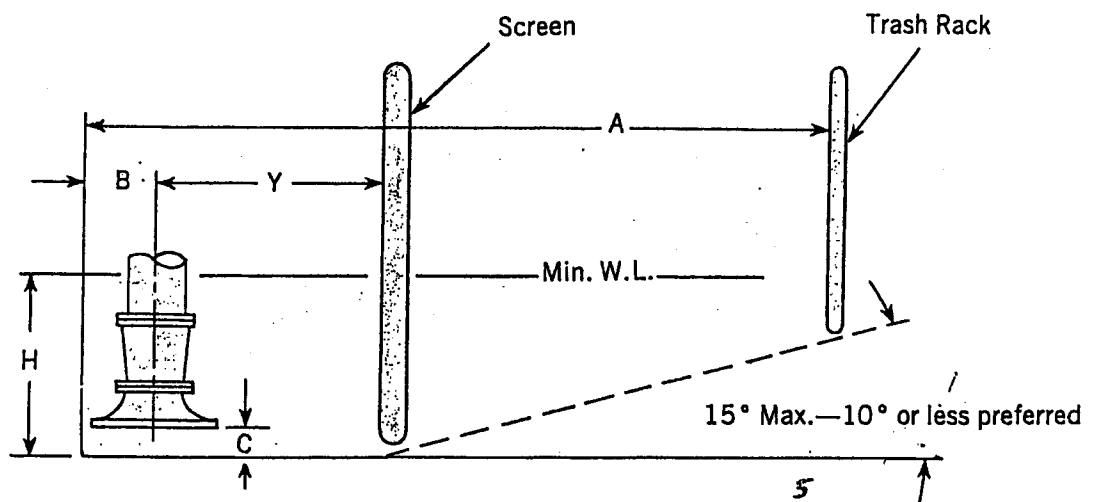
SUMP DIMENSIONS ELEVATION VIEW
